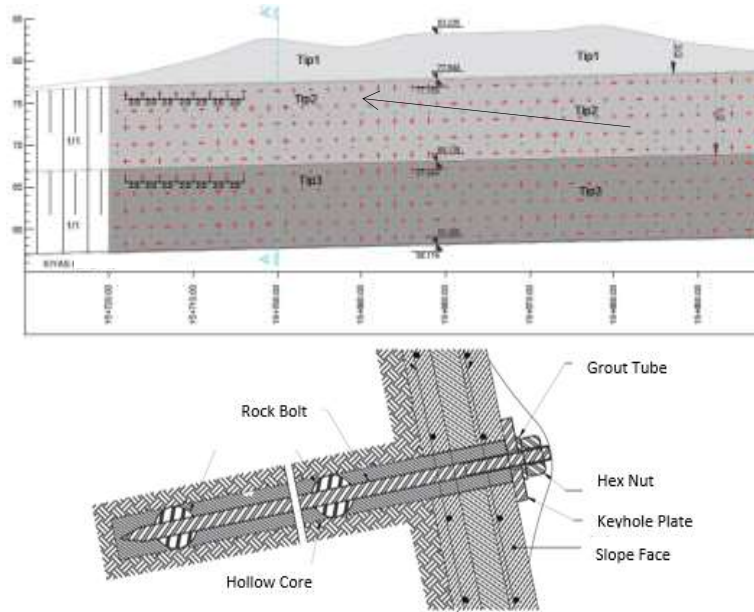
Rock Bolt Application on Cross Section of Rock Slope
